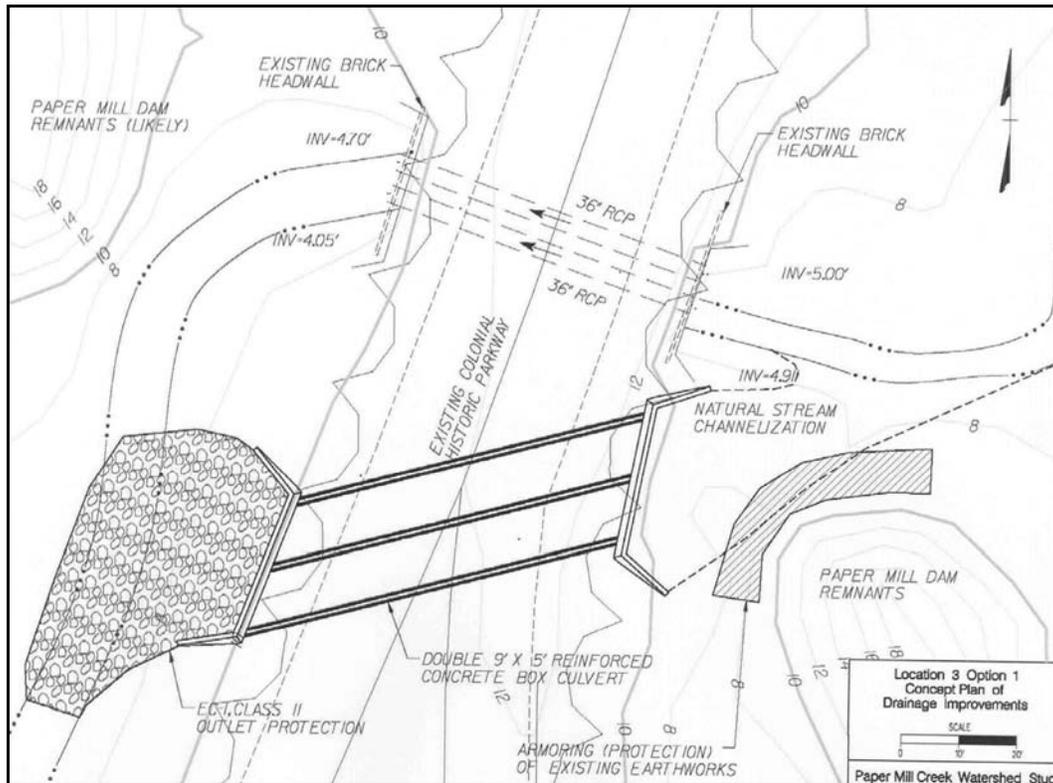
Concept Plan of Alternative 3 at Site B (Add Parallel Culvert System); Source: NPS, 2005
